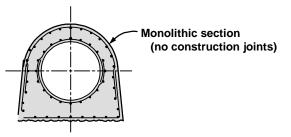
Concrete placement for a reinforced castin-place conduit.
